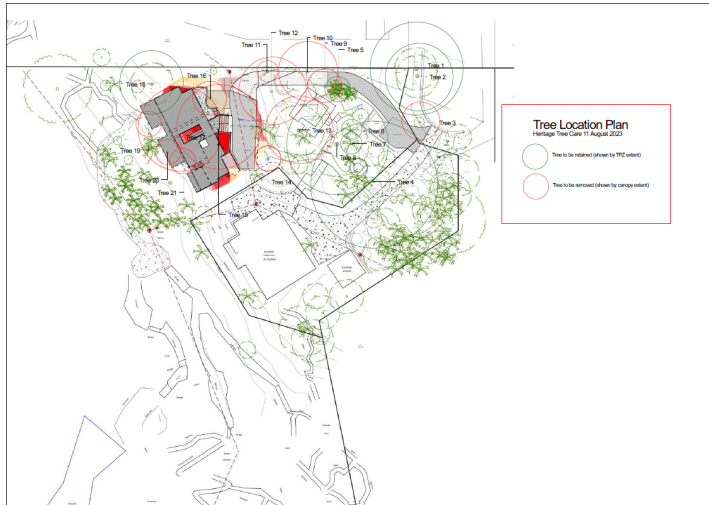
Extract from submitted arborist report – tree removal and retention plan
